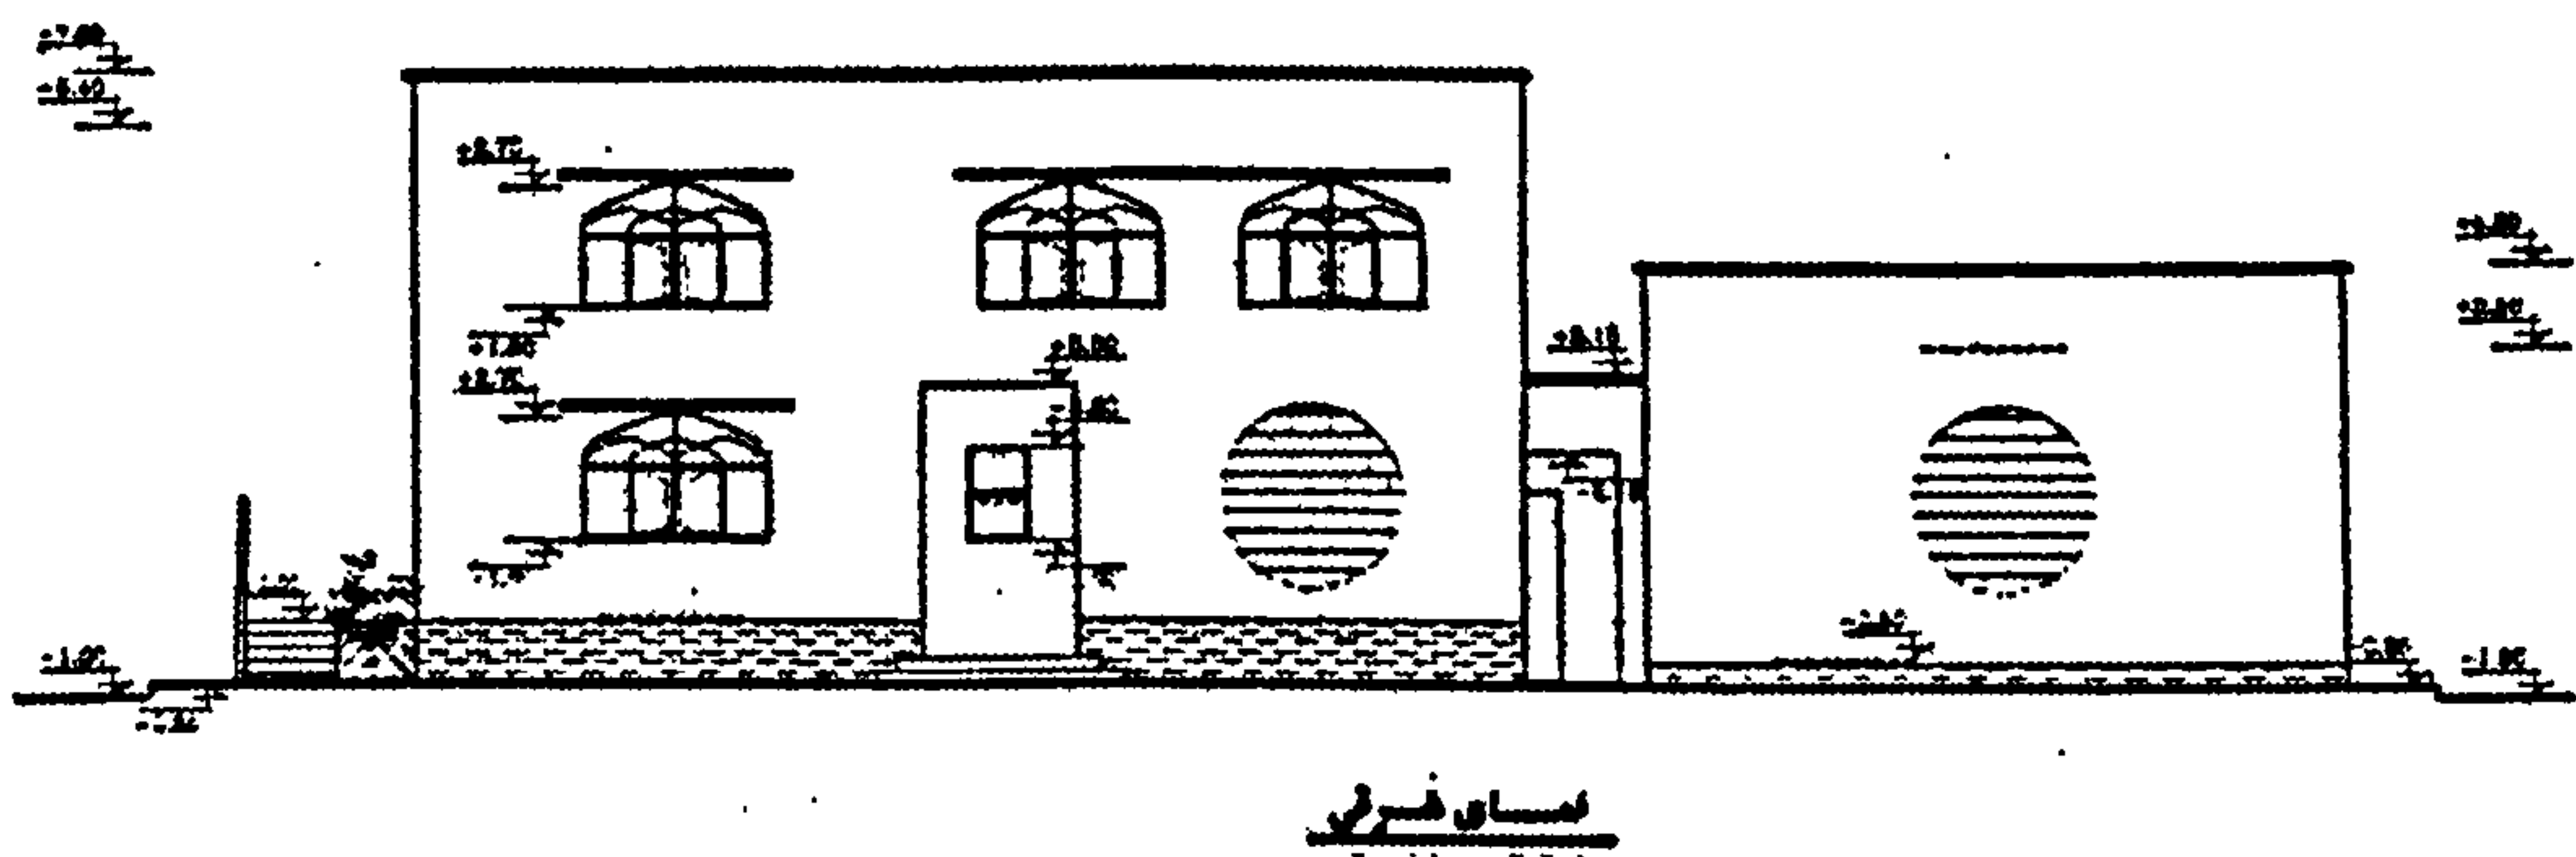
The south elevation & section A-A of a special primary school with 5 classrooms (Number 4)
